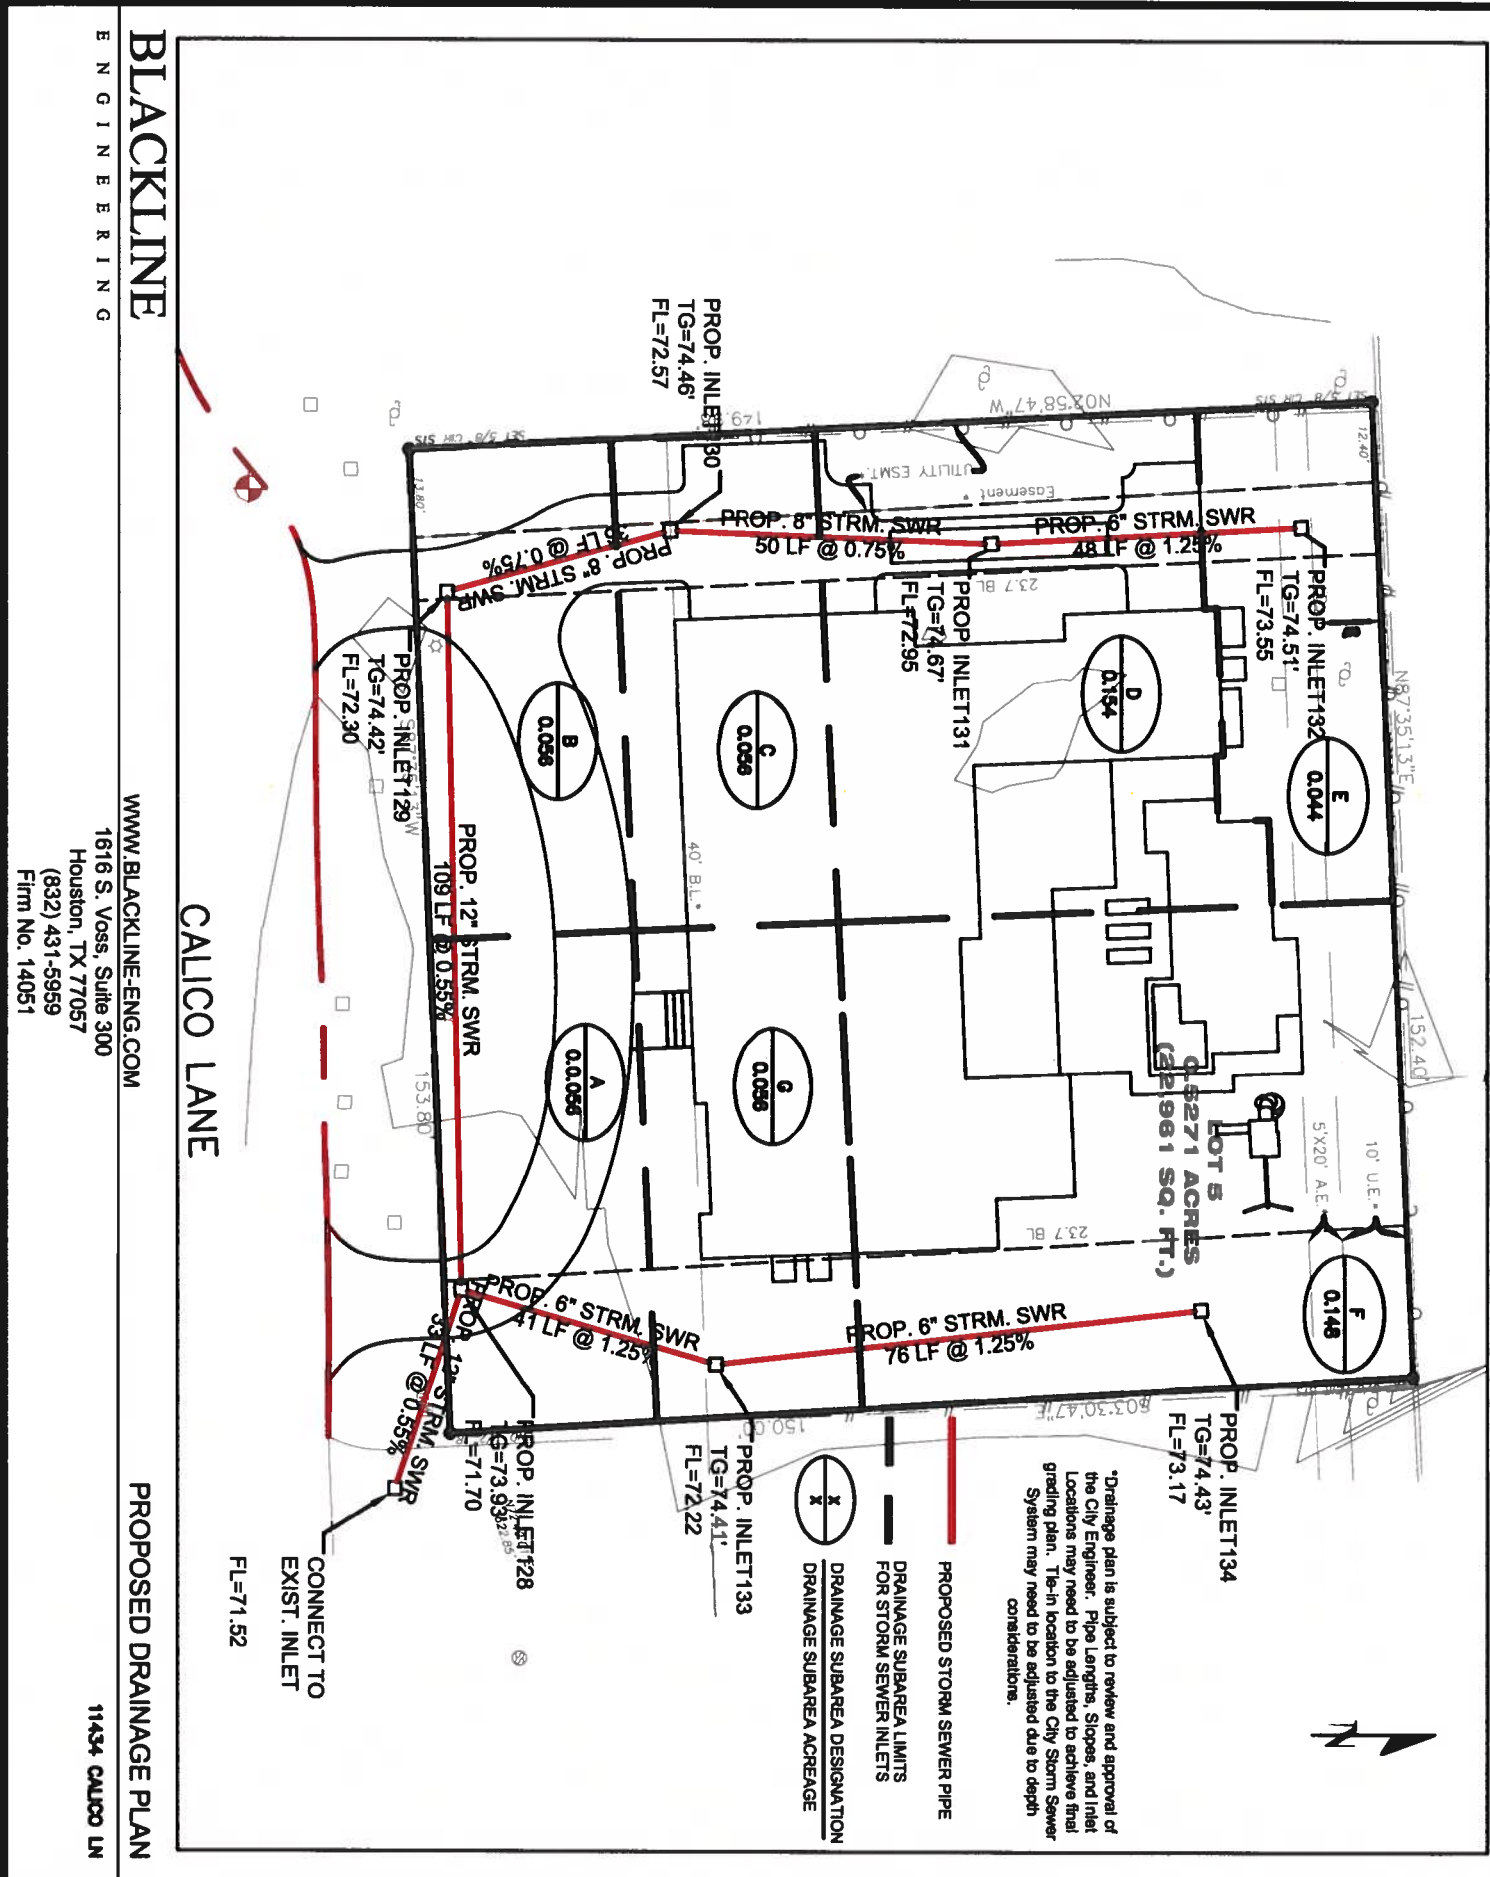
EXHIBIT F- PRELIMINARY STORM SEWER DESIGN
